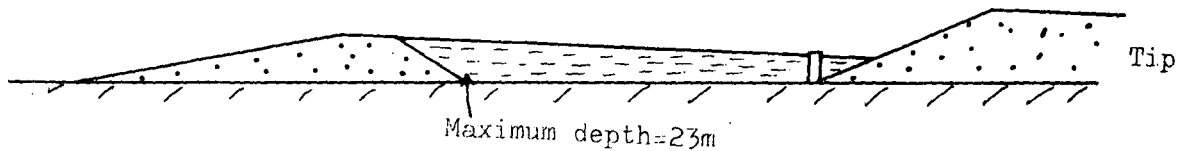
Section along the line of the culvert, lagoon 16, Silverhill.
